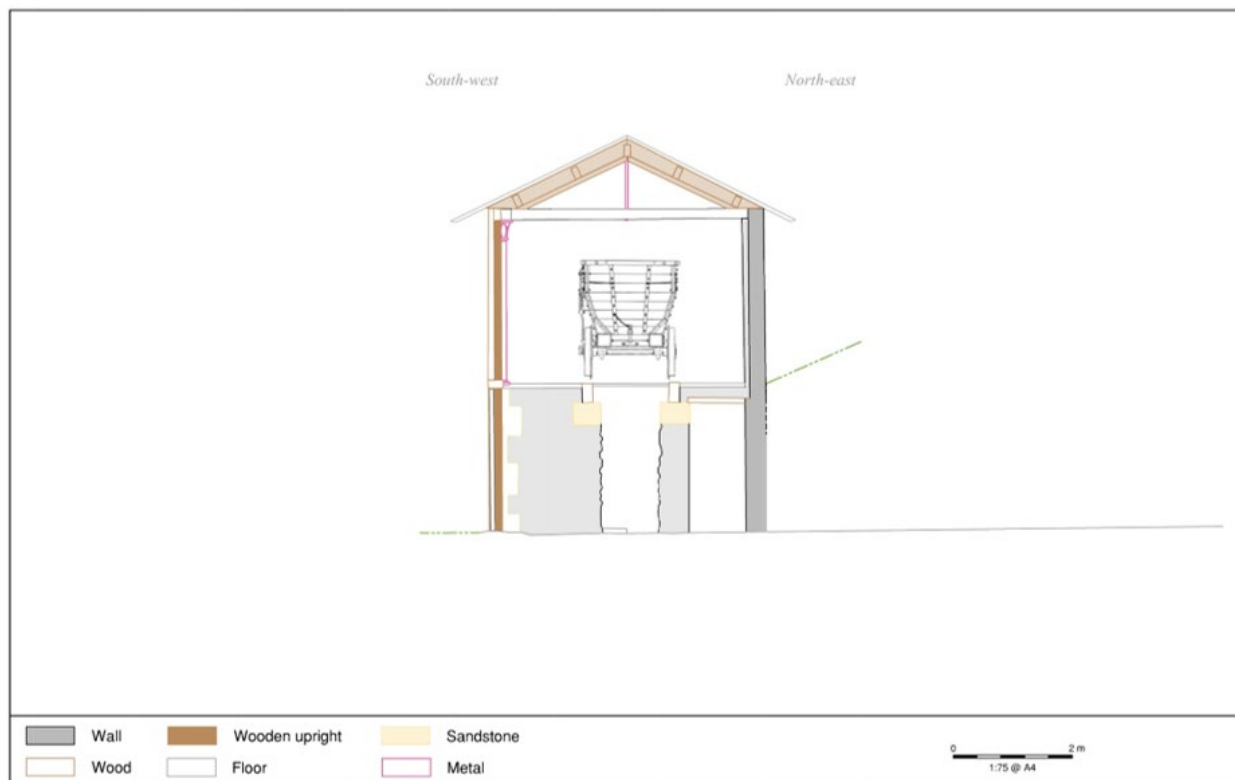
Cross section through the lime depot showing: at first-floor level, the area where waggon unloading took place (waggon added for illustrative purposes only and not to scale) plus the iron decorative columns to the street front; and at ground-floor level, the later breaks in the walls between cells 3 and 4, the sandstone pads supporting the waybeams and the ashlar-fronted walls dividing the cells at street level.
